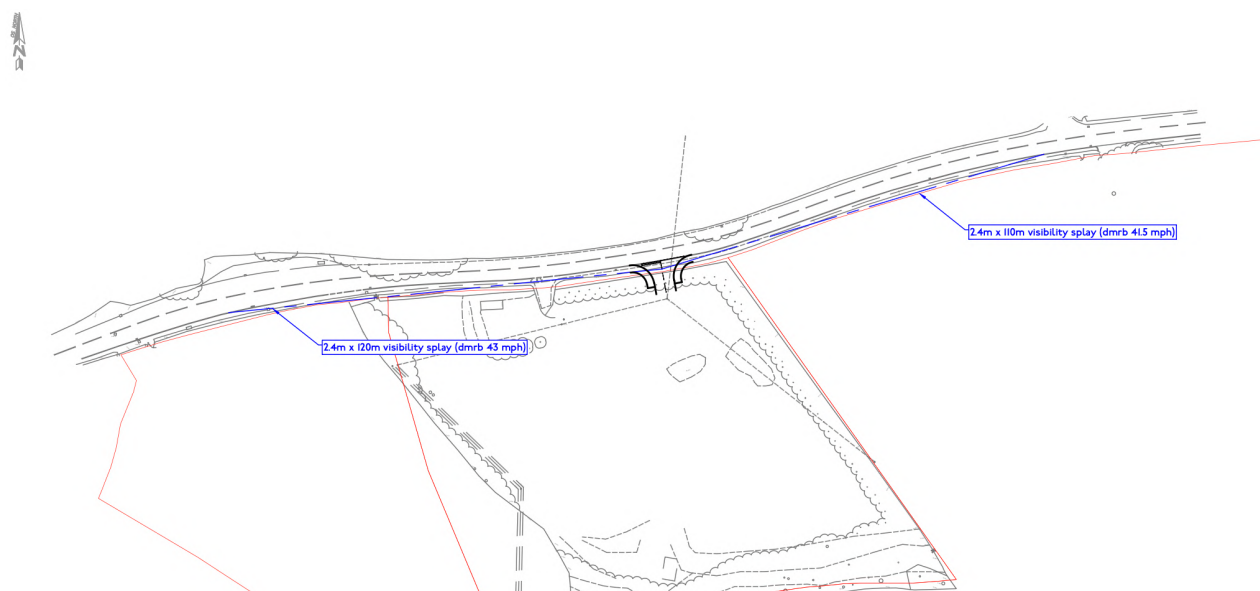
Proposed Site Layout (source: Zara Moon Architects)
